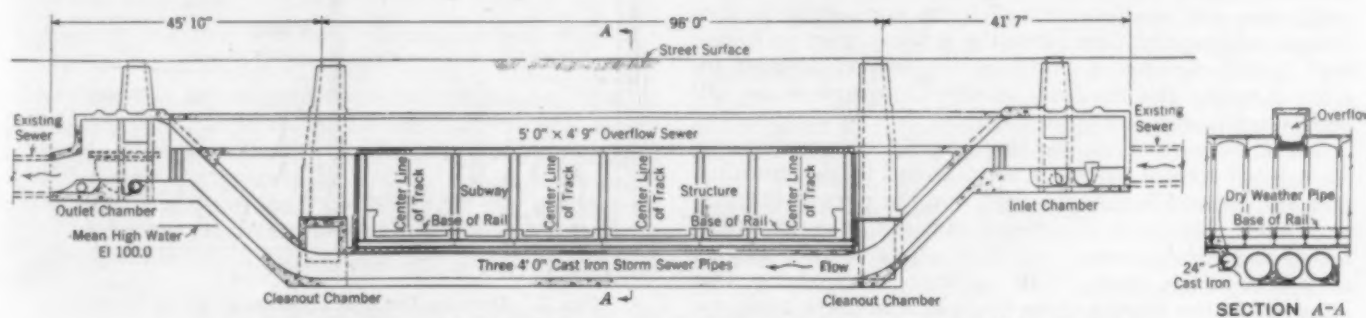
SIPHON FOR SEWER CROSSING THE ST. NICHOLAS AVENUE LINE AT 124TH STREET
